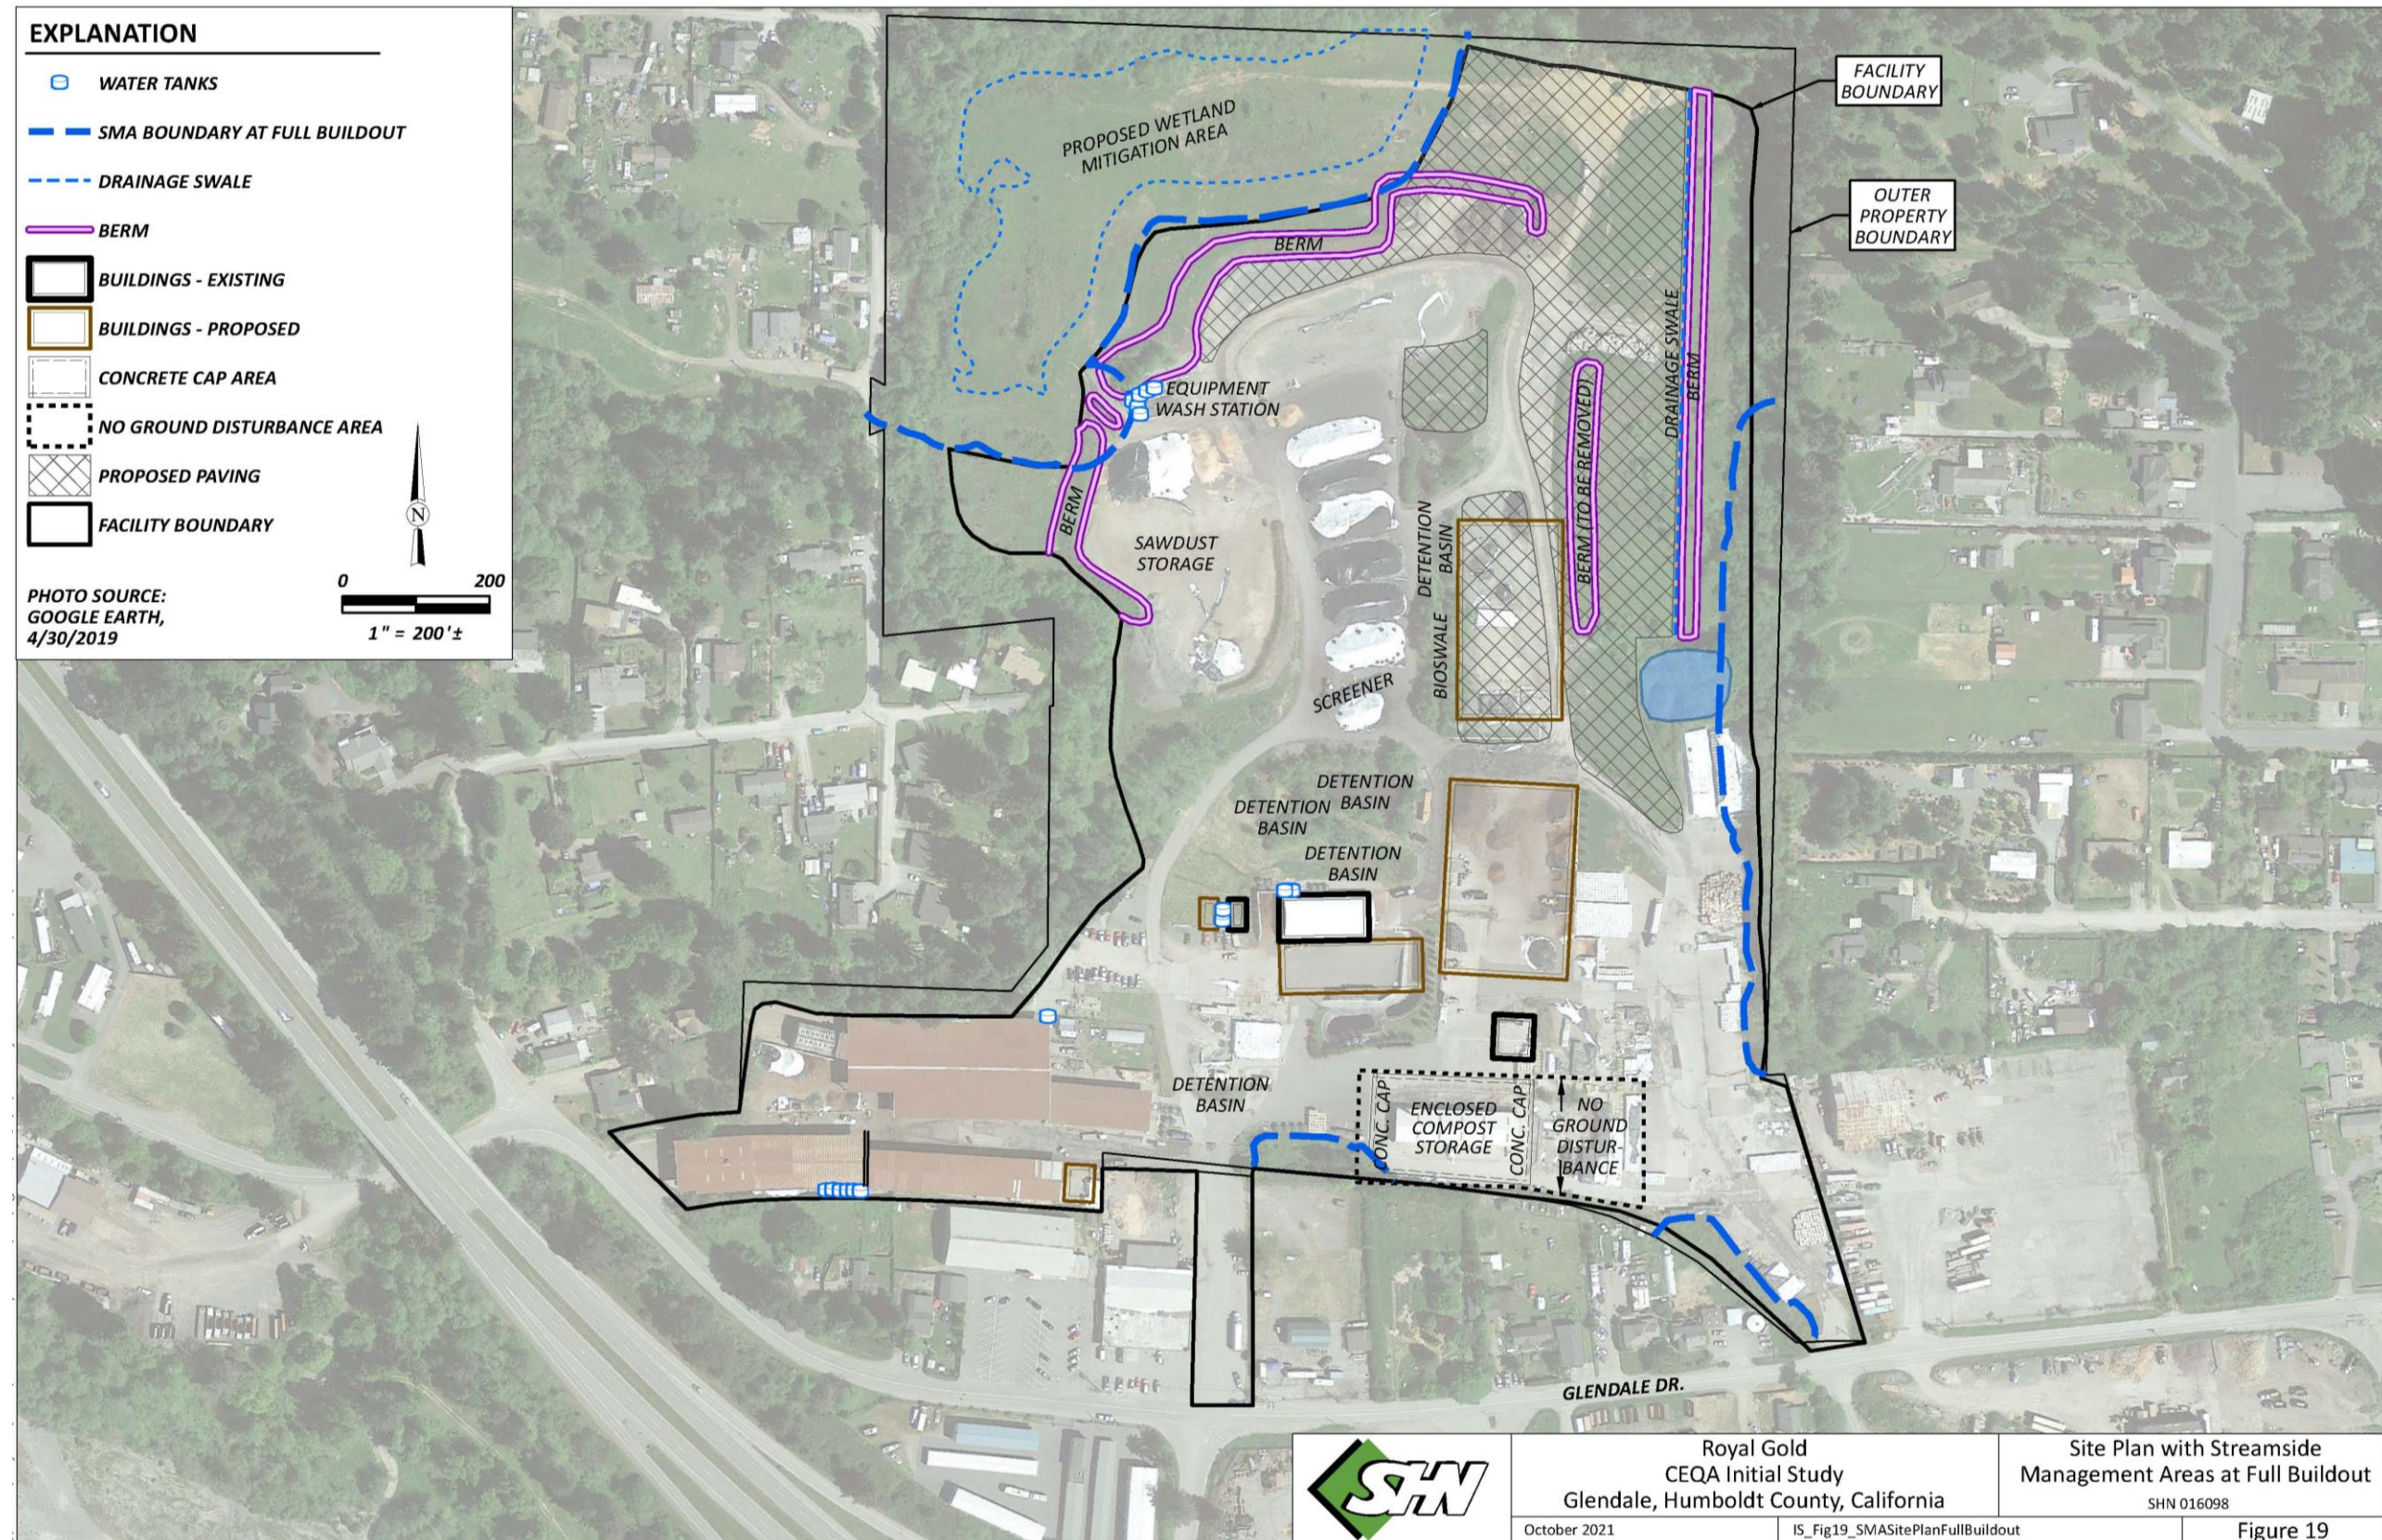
Site Plan with Streamside Management Areas at Full Buildout
